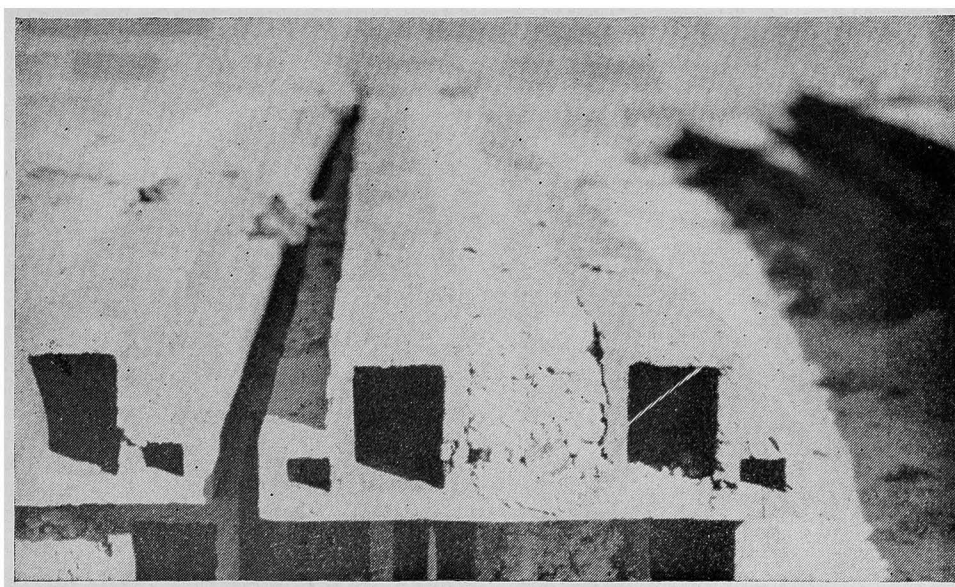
(a). End of precast beam, showing reinforcing steel and concrete cast to top of trough.
